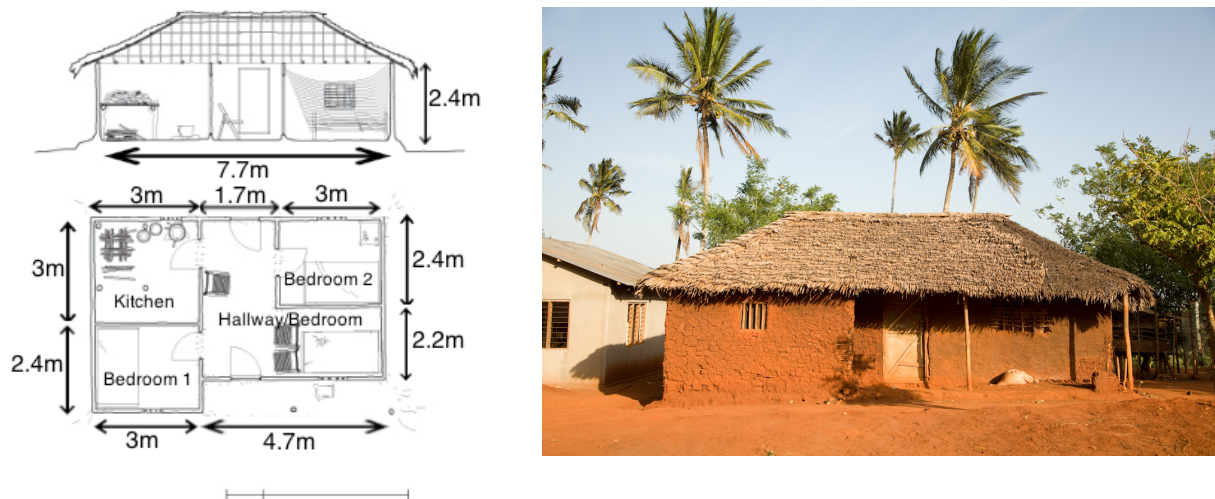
Floor plan and photograph of House 1 design¹⁶
